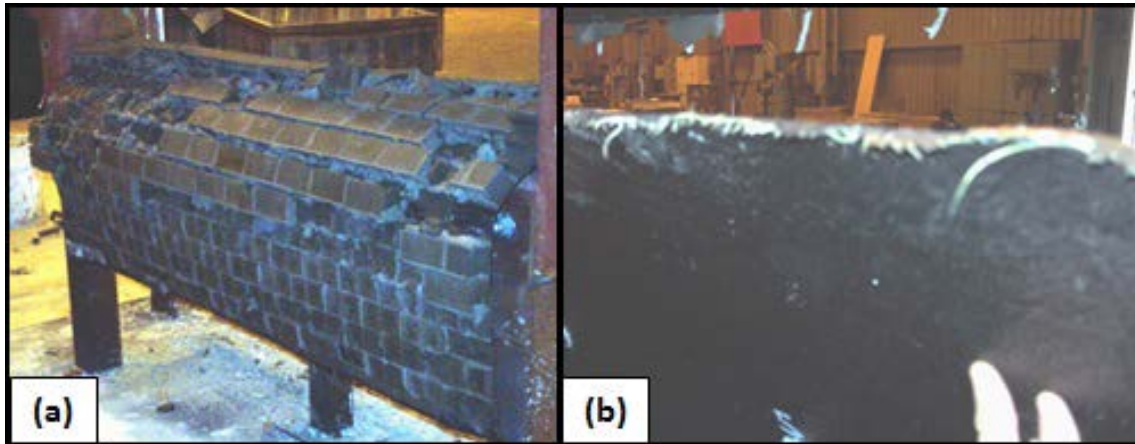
SW4. (a) Failure of Wall SW4. (b) Retrofit failed when it tore along the top support.
